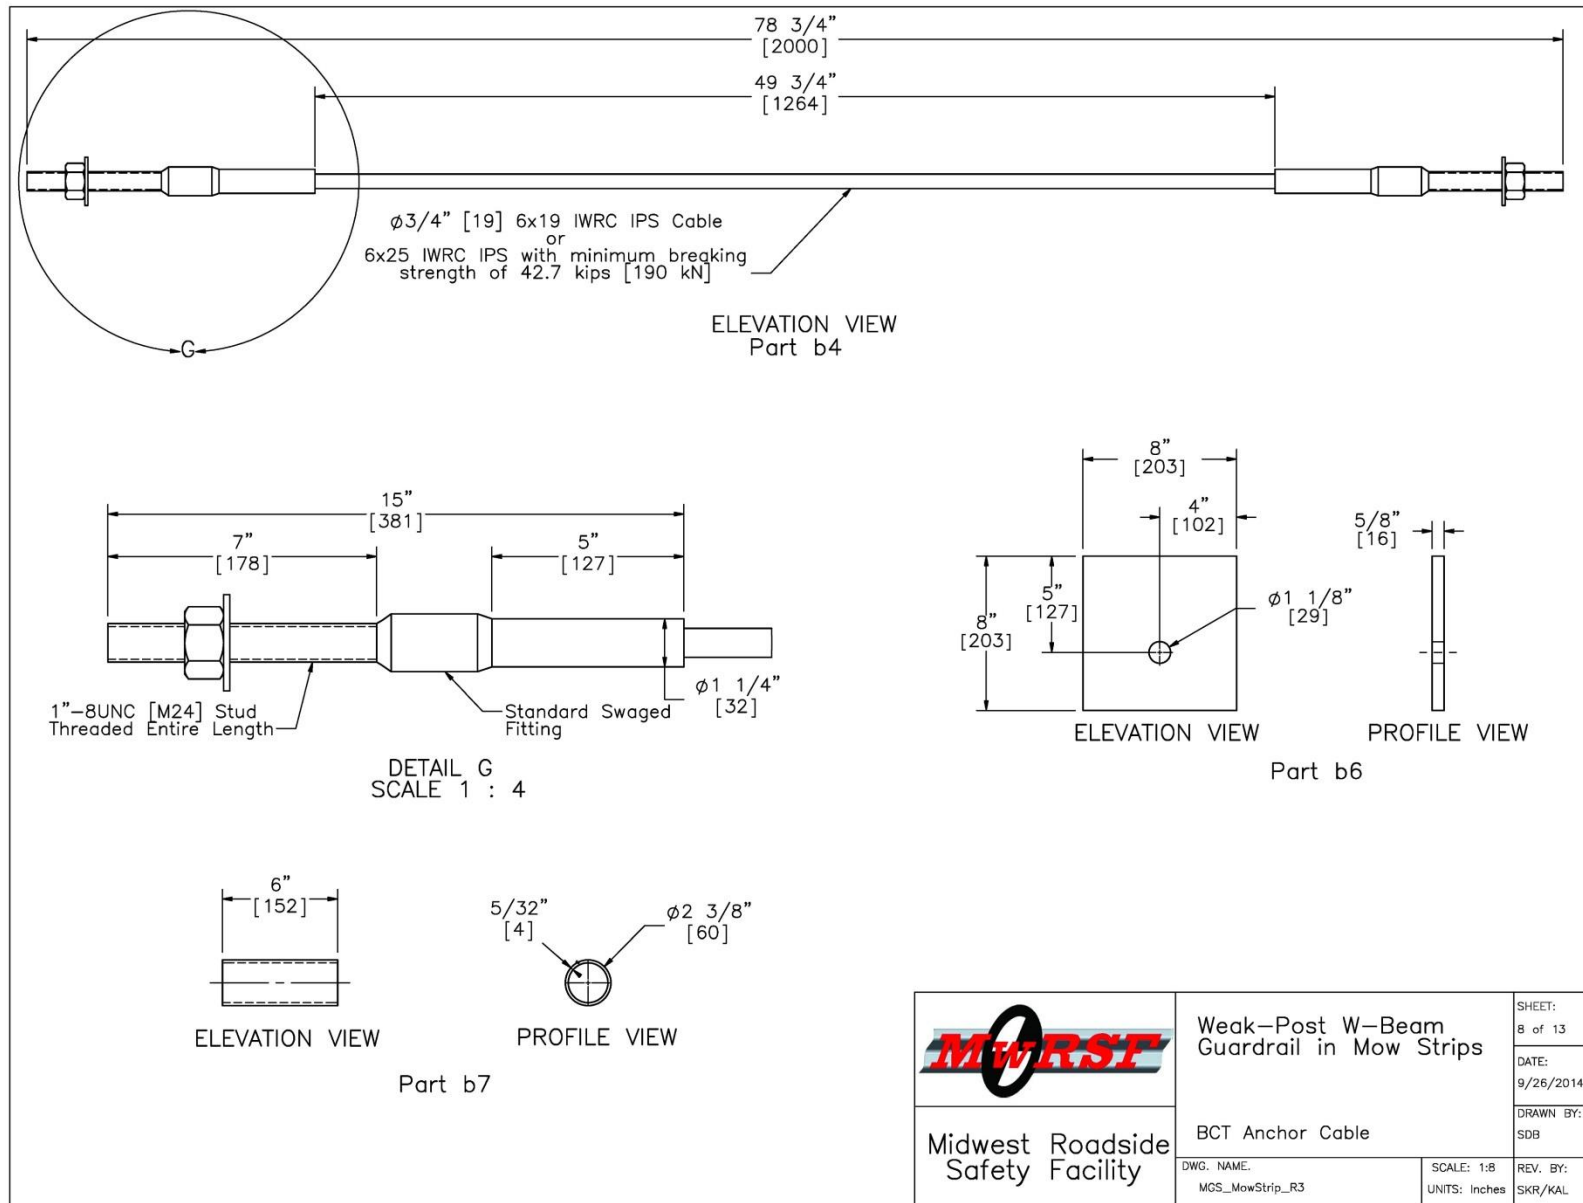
Cable Anchor Details, Test No. MGSMS-1
